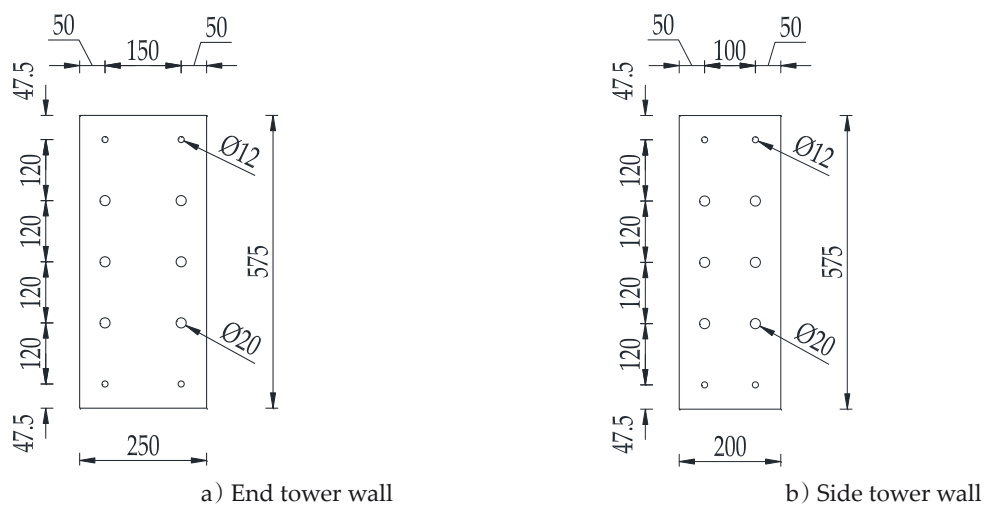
Tower wall cross-section in anchorage zone (unit: mm)
